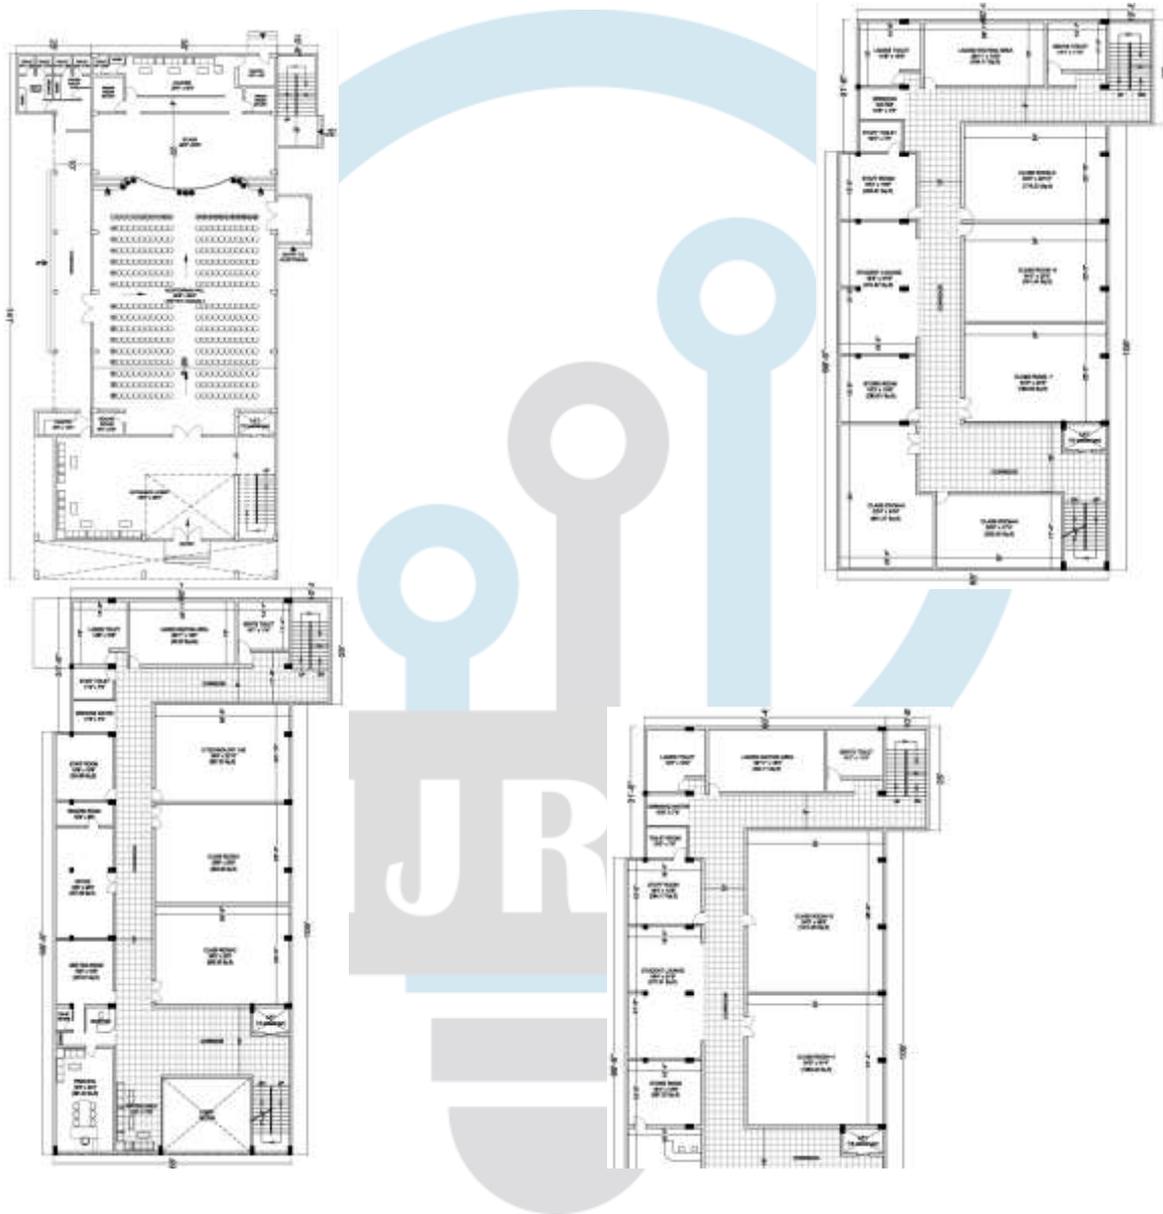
architectural plan of ground, first, typical, fourth floor
